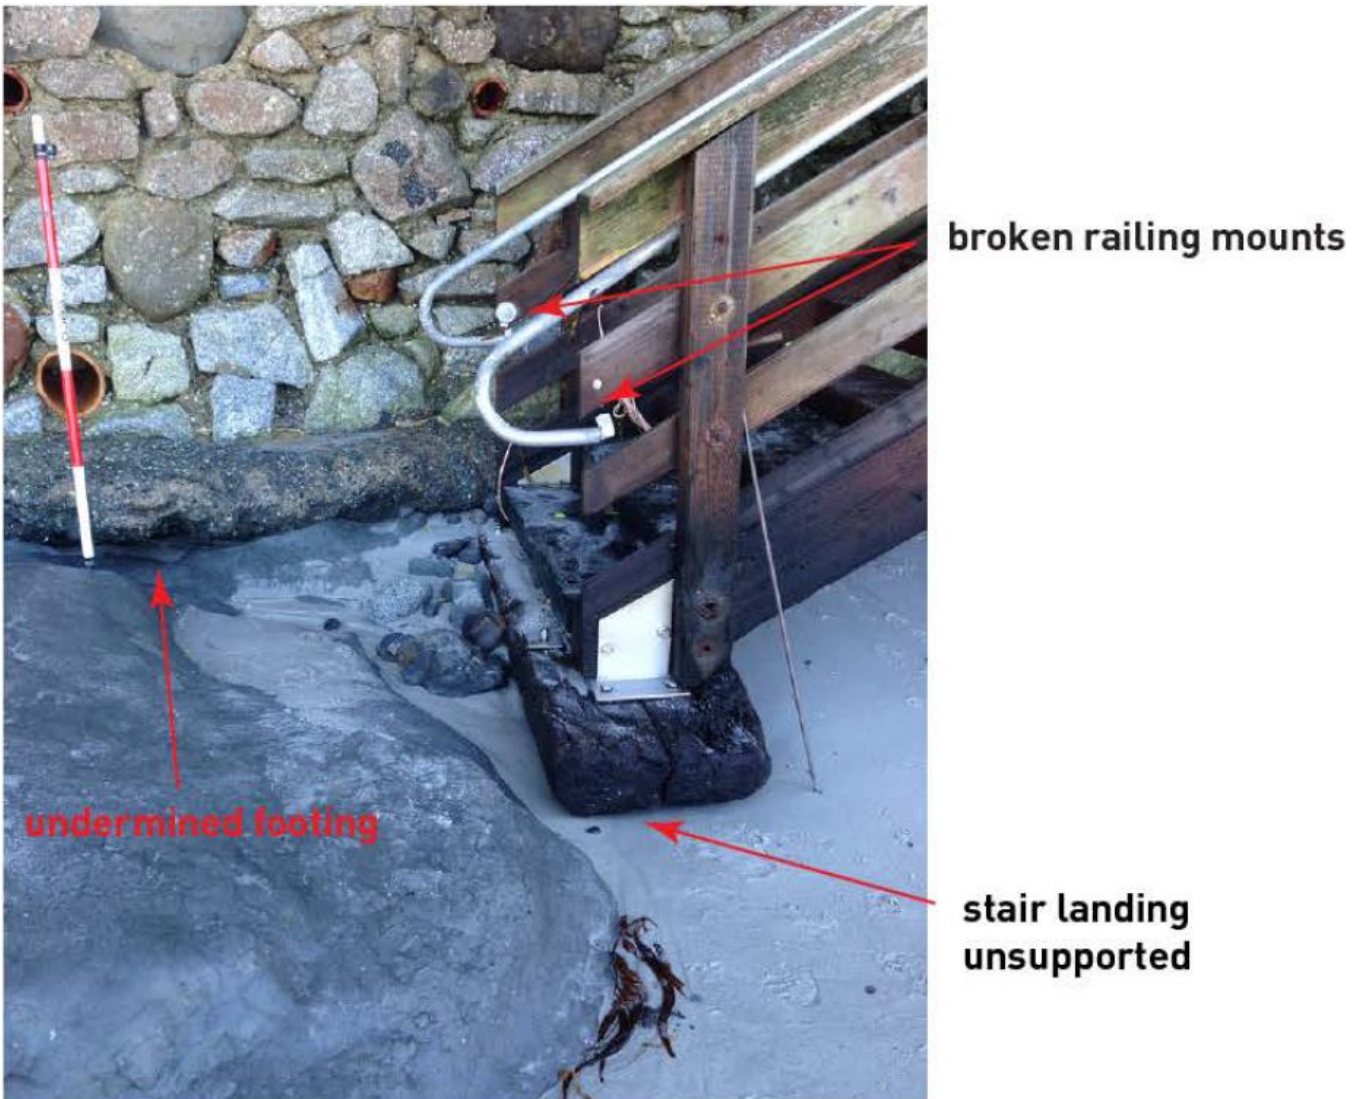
Public Access Stairway ST1 on December 22, 2022
